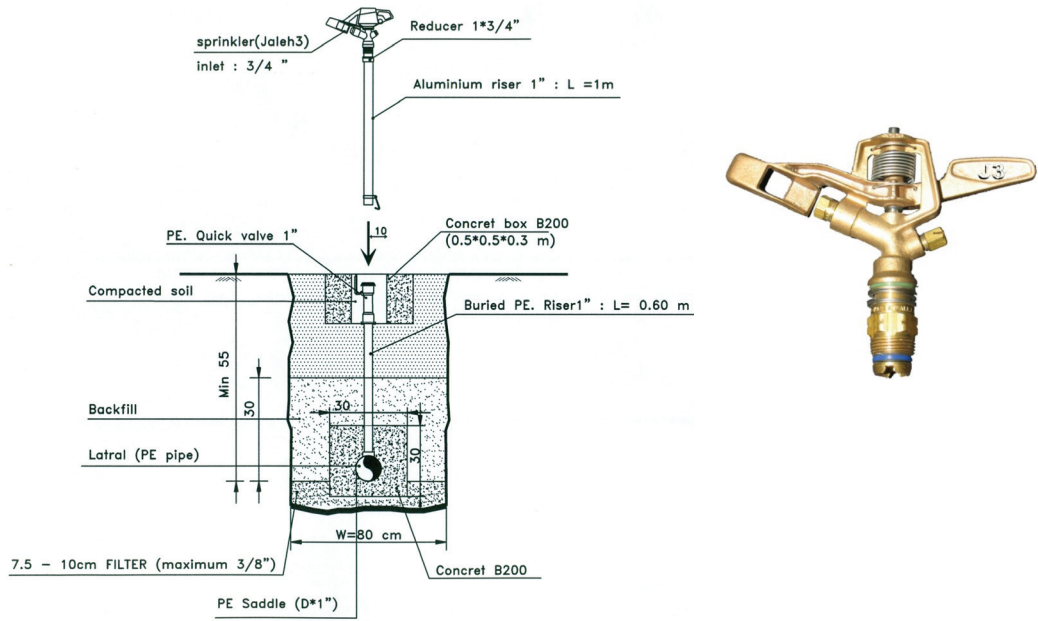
Sprinkler branch from lateral pipes (left) and close up view (right) : Branche d'arrosage de conduits latéraux : a gauche et vue d'enlarhget : a droite)
